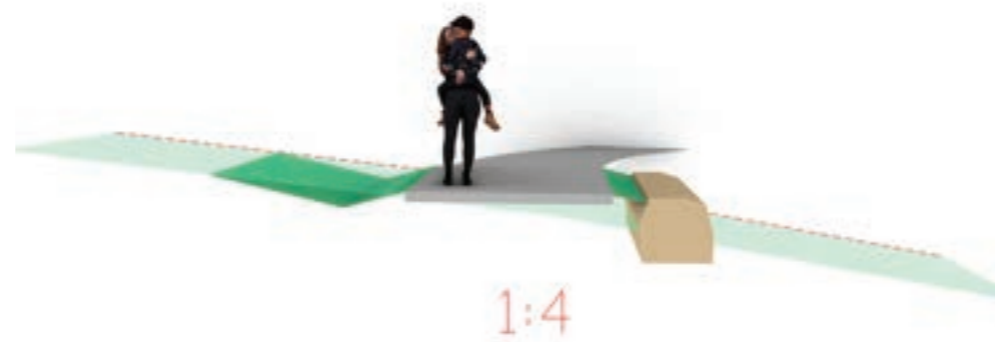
Cut and fill with 1:4 batters and swales with boulder edge at toe of slope
